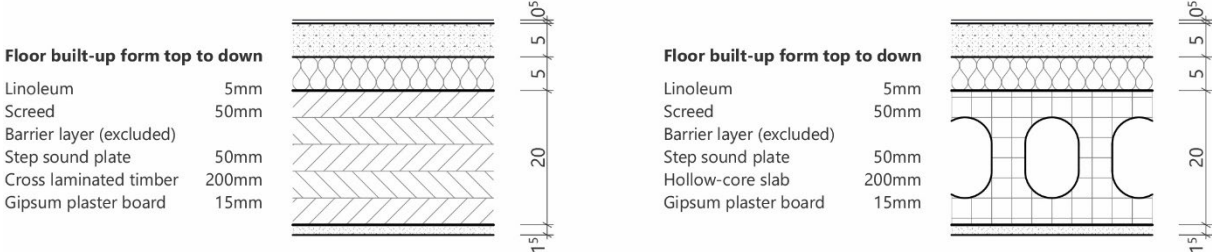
Floor build-ups for comparison. Left: CLT slab with floor build-up. Right: Concrete hollow-core slab with floor build-up.
